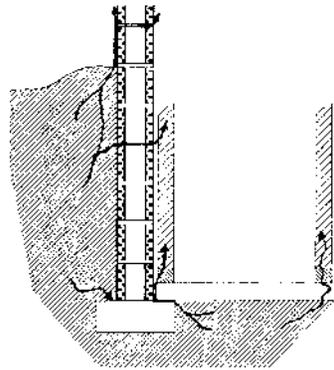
Basement construction (arrows indicate possible termite entry points).
